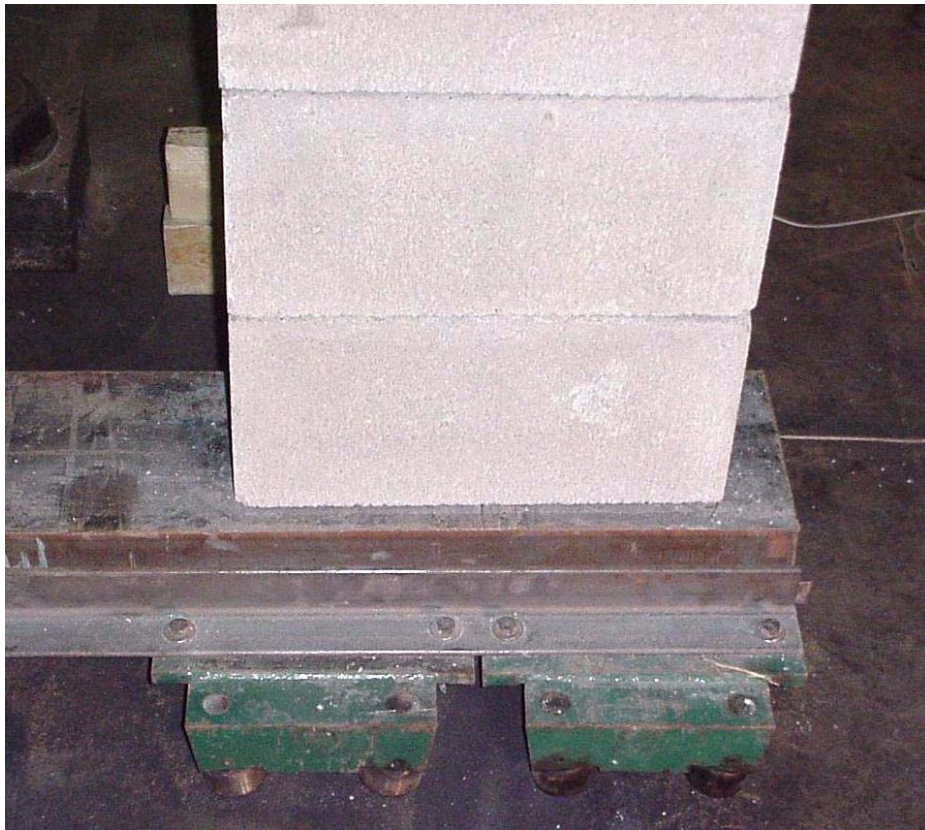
Block column rests on rolling platform to allow load cells to measure lateral loading.
